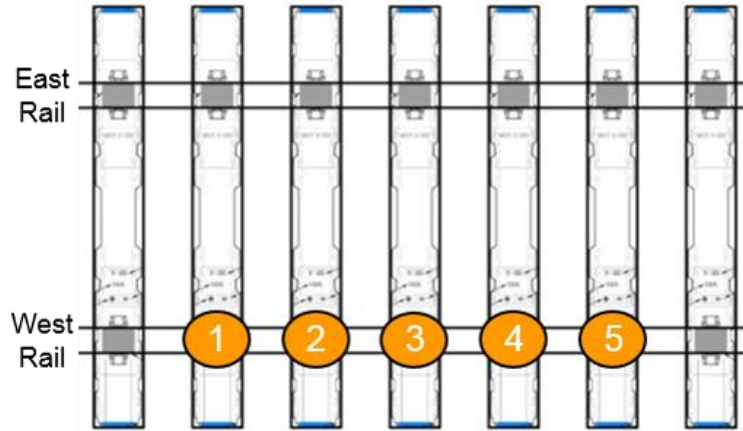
Plan view of MBTSS lab installation on the TLS
